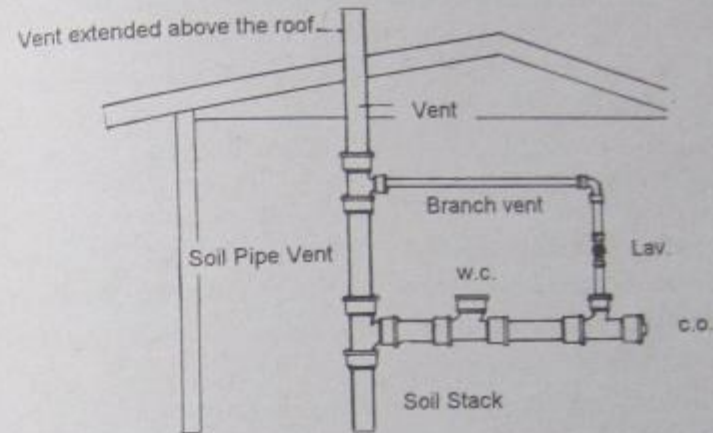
VENT STACK EXTENDED THROUGH THE ROOF
